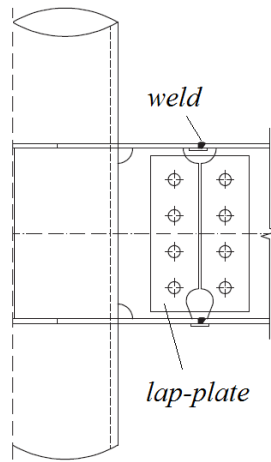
Bolted lap-plate connection in beam-tubular column connection (Li et al. 2013)
